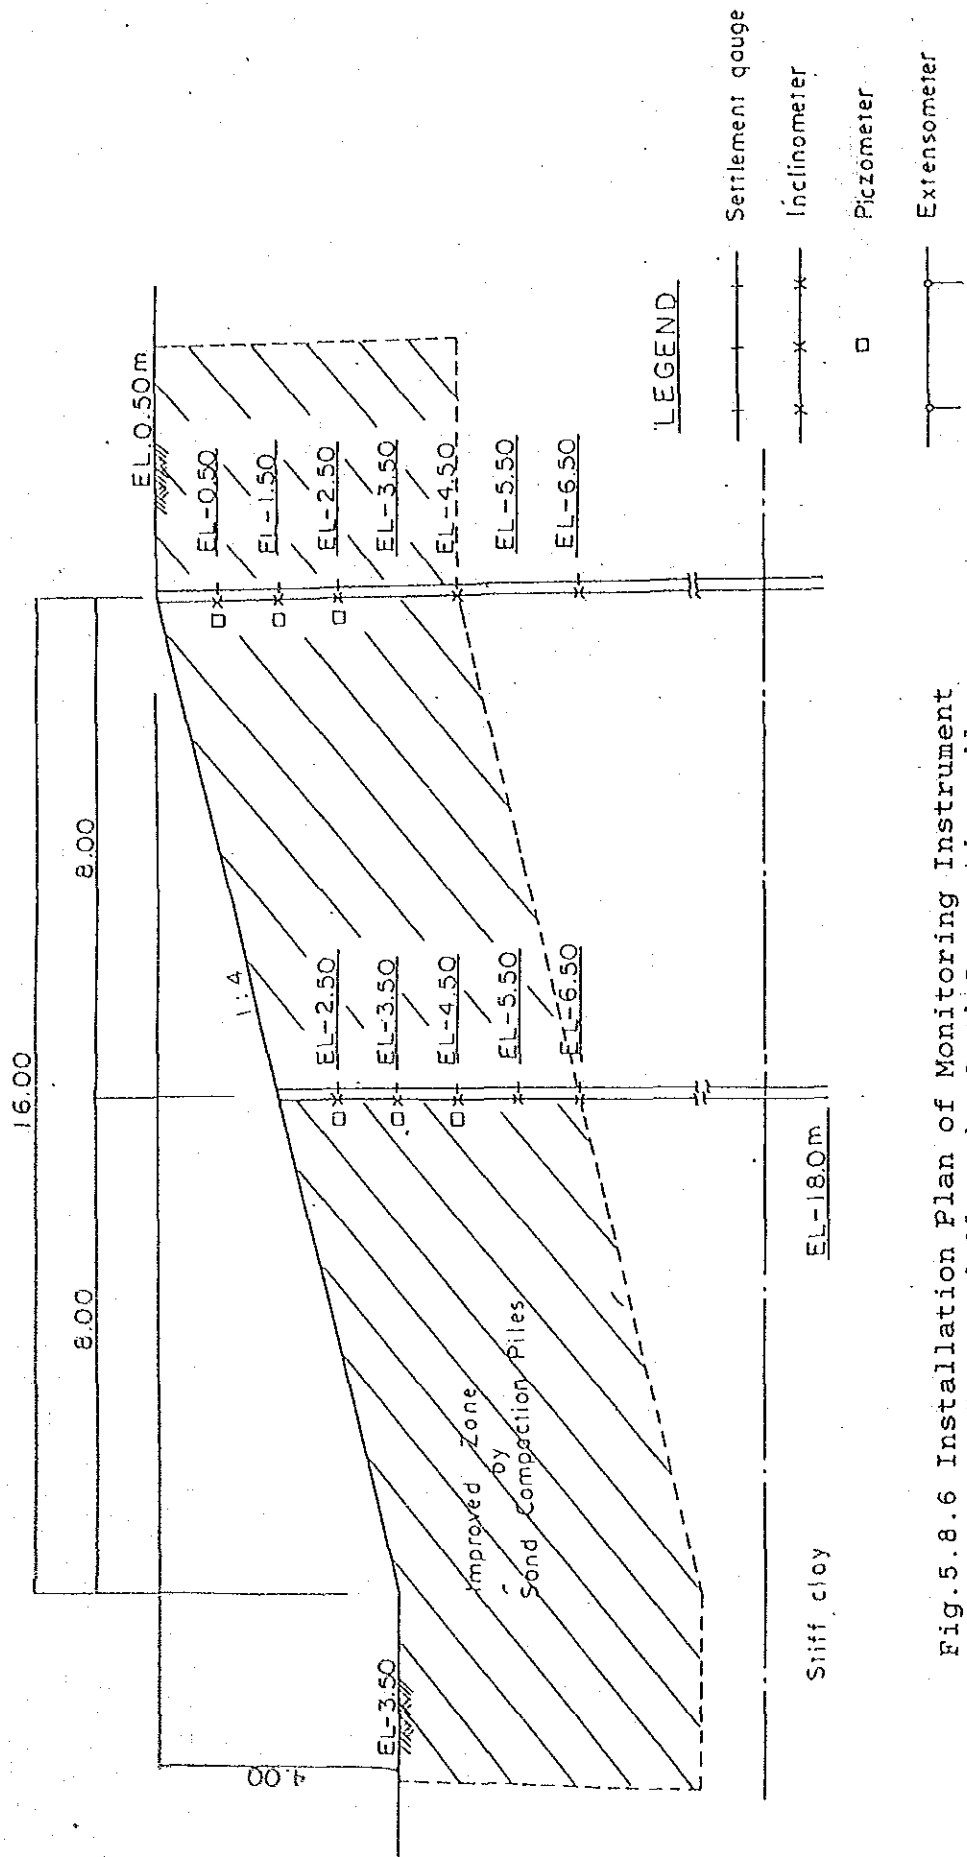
Installation Plan of Monitoring Instrument on Improved Slope by Sand Compaction piles
